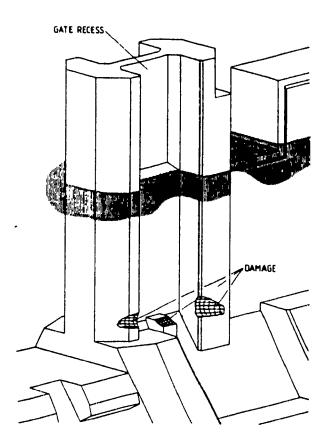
LOCATION OF DAMAGE TO PIER STRUCTURE
